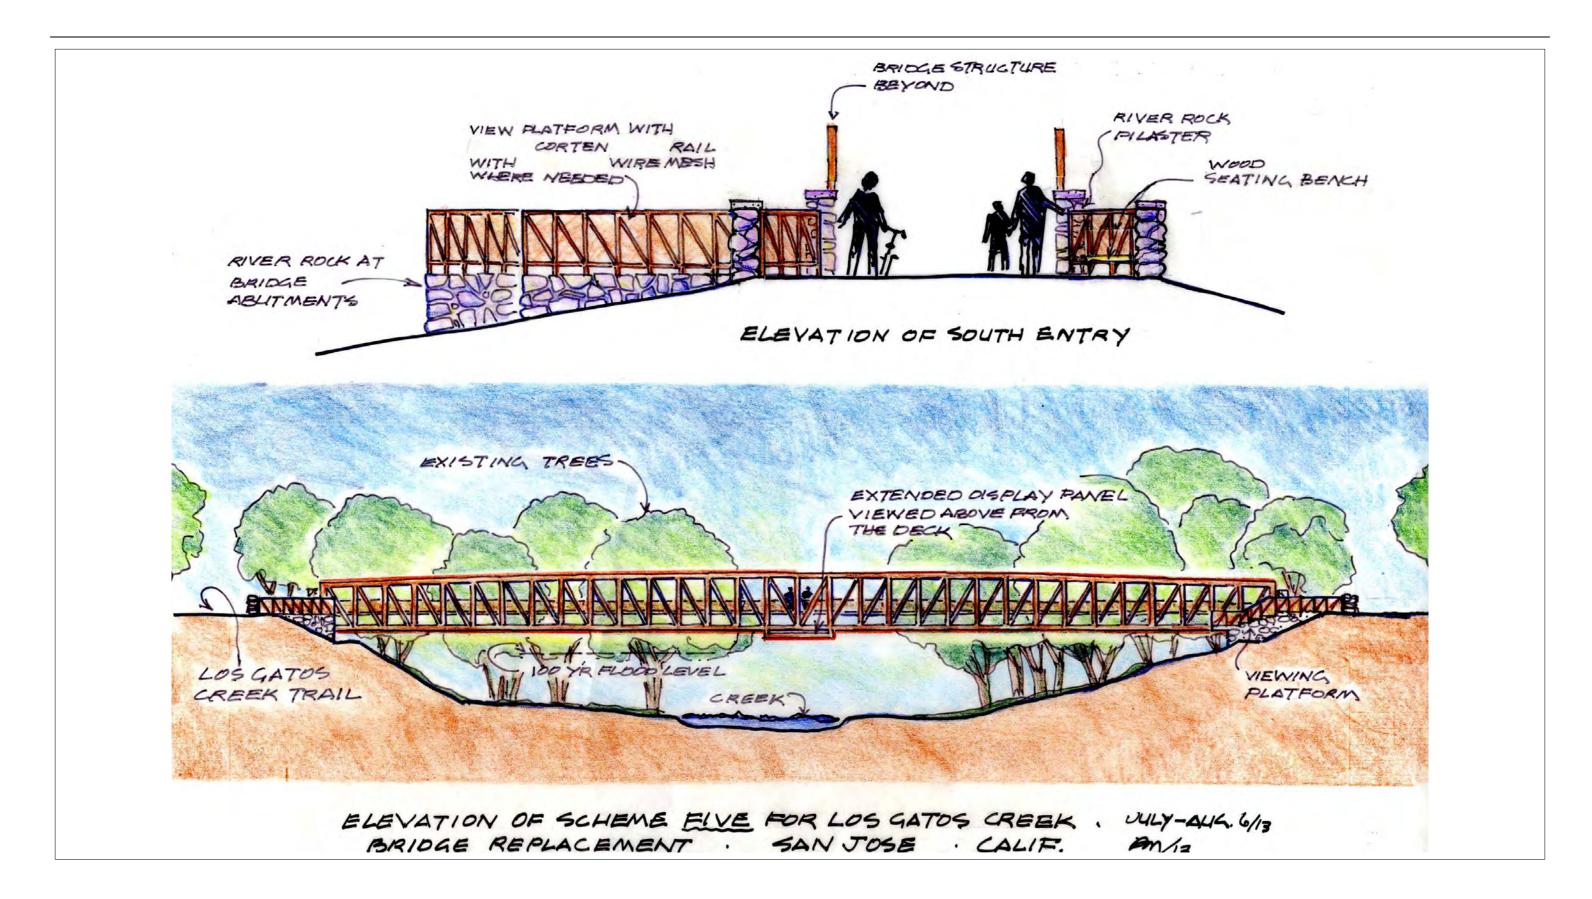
Schematic Elevation Drawing Three Creeks Pedestrian Bridge Project *City of San Jose San Jose, CA
